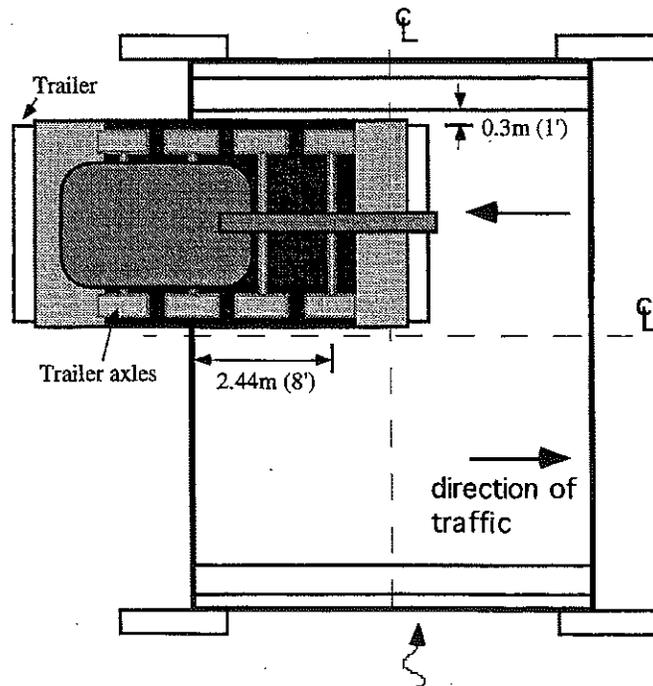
Instrumentation Layout for Bridge No. 1.
